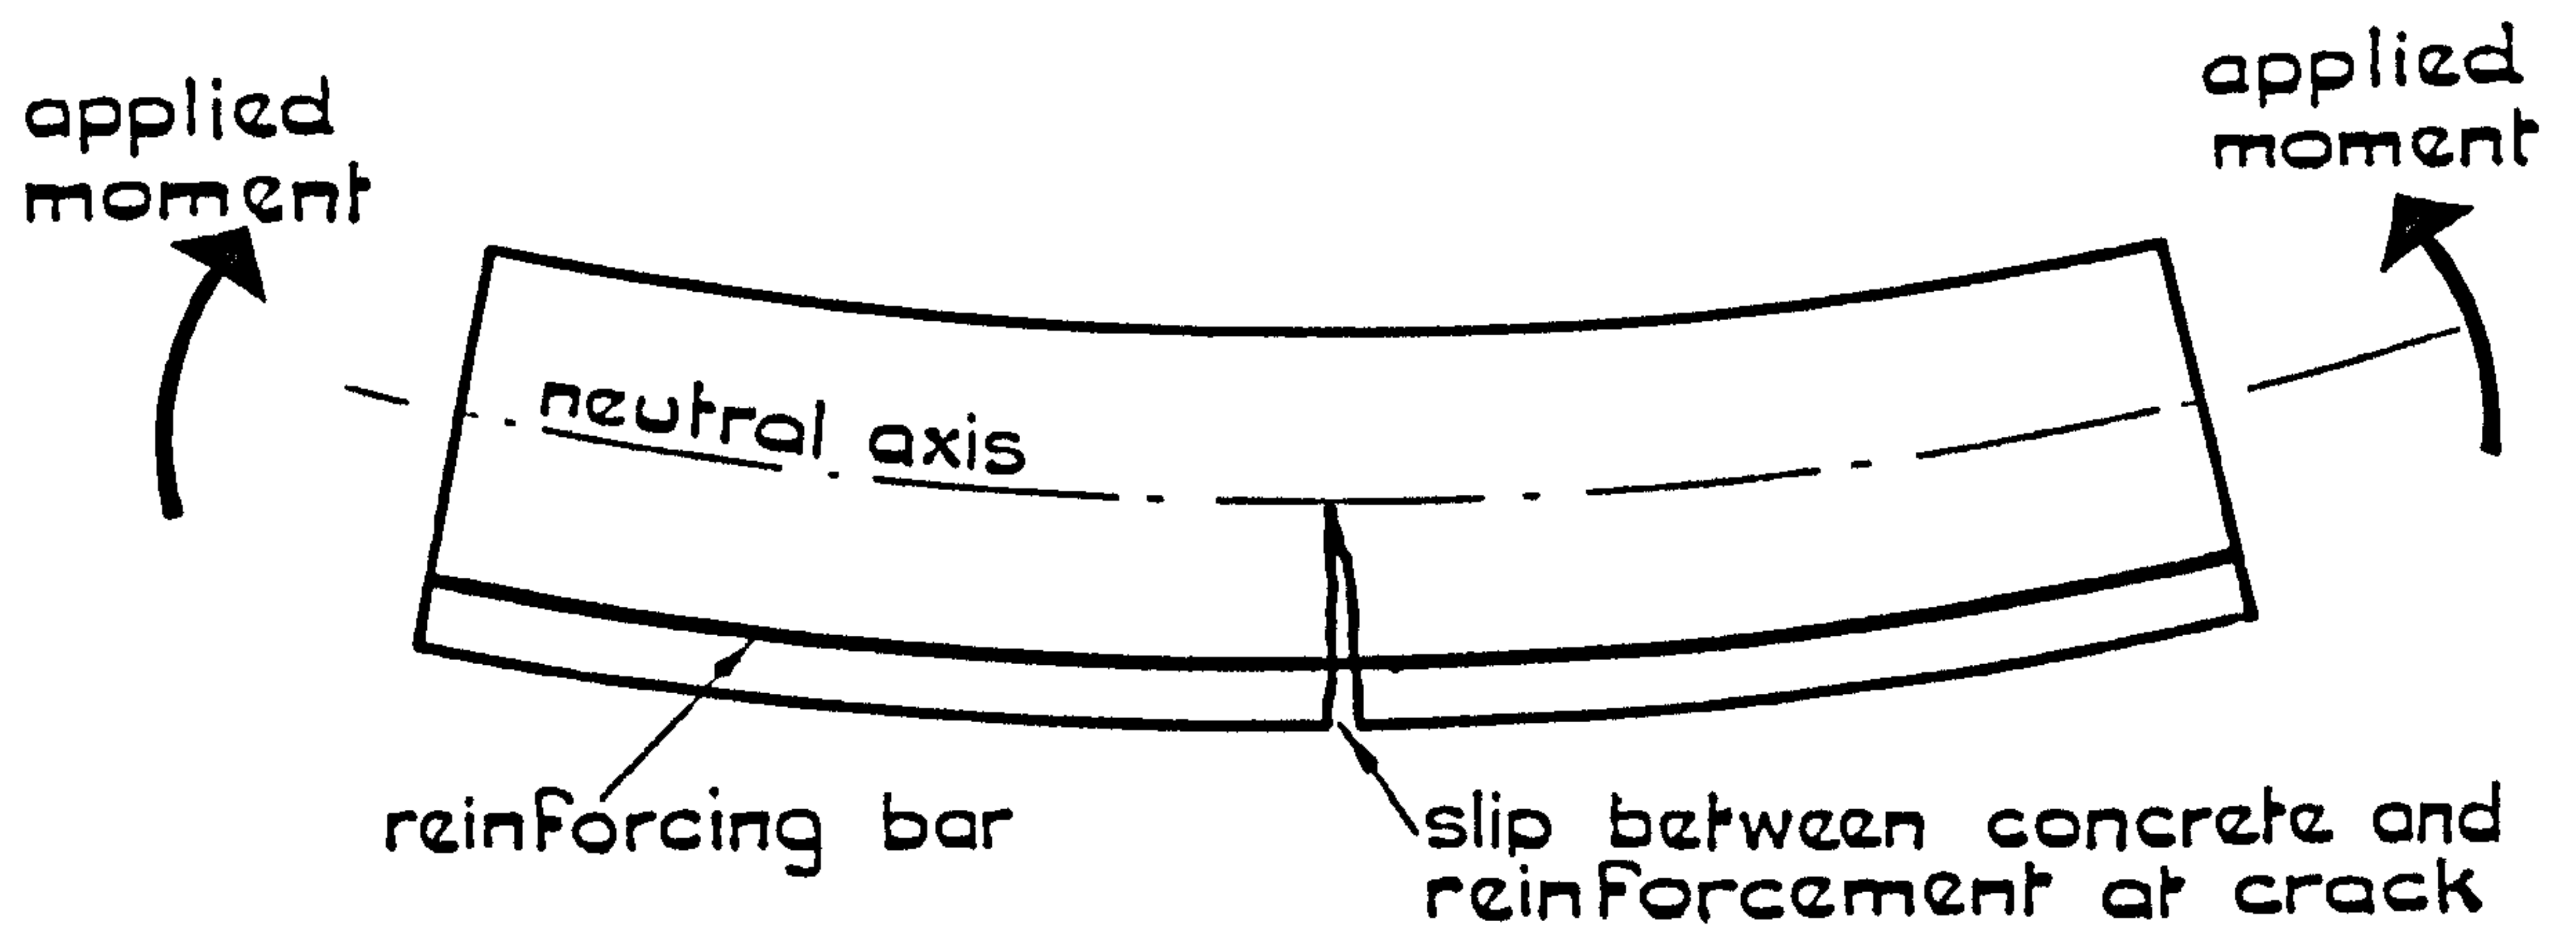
CRACKING IN BEAM SUBJECTED TO PURE BENDING
